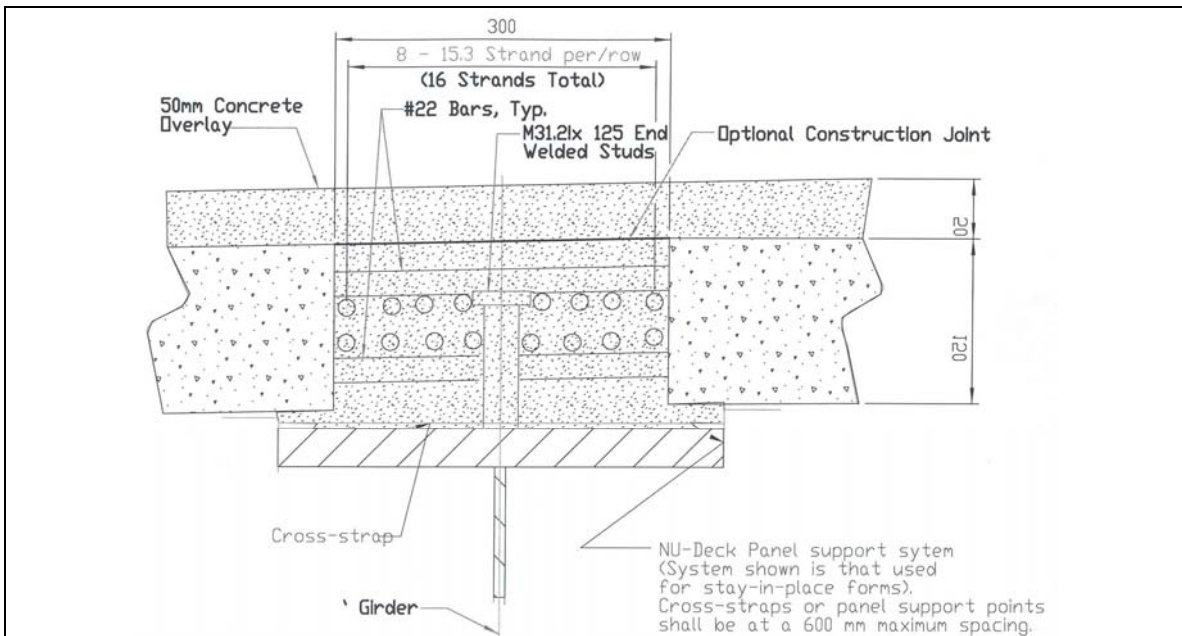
Open channel and shear connectors over typical girder (NDOR, 2002)
